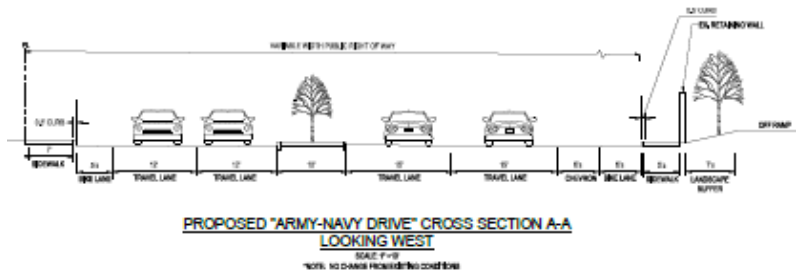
Proposed Street Cross-Sections (Source: PDSP Submission, Sheet CIV704)
